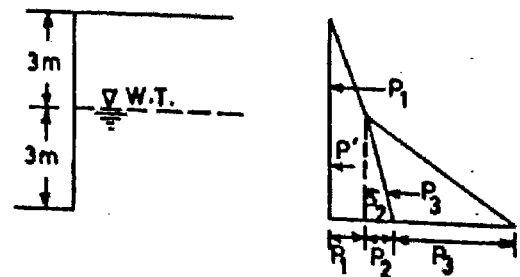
Retaining wall and pressure distribution diagram—Example 12.1
